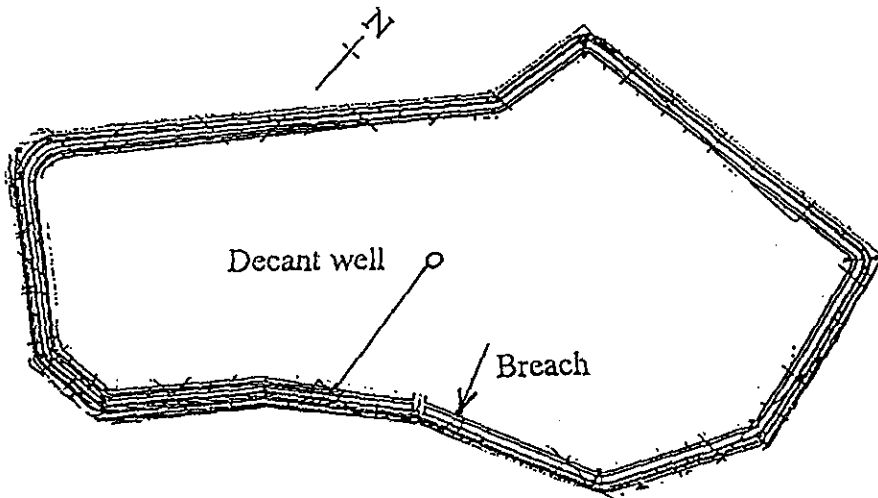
Baia Mare. Plan of new impoundment showing position of eventual overtopping and breach.
